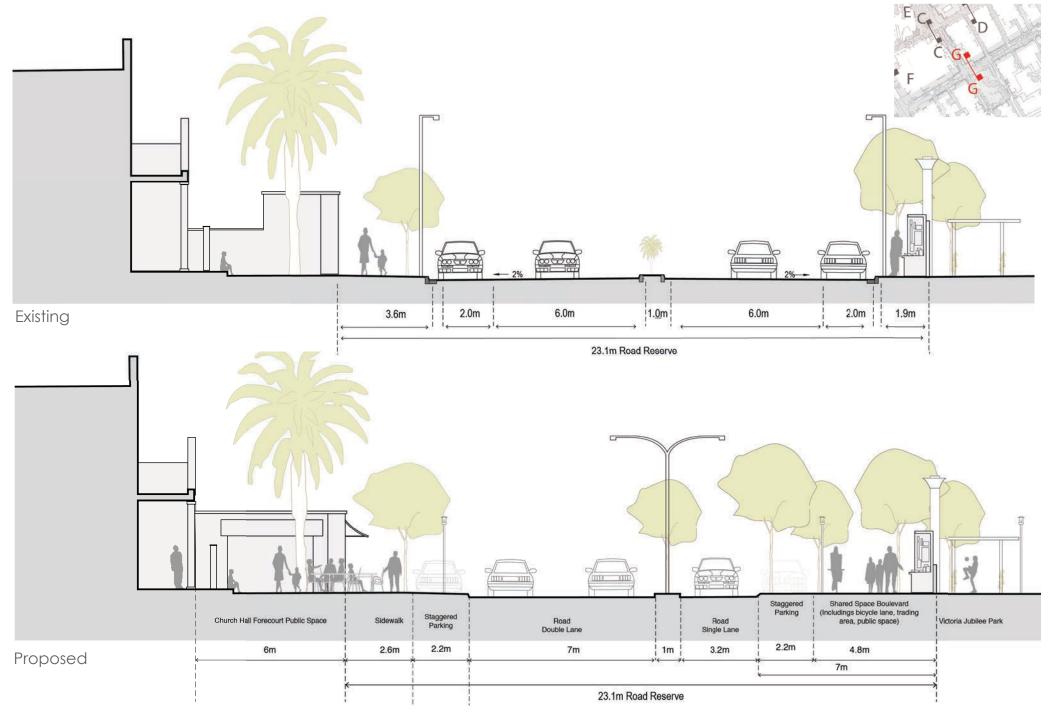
CHURCH STREET SECTION BETWEEN THE CHURCH HALL AND VICTORIA JUBILEE PARK: SECTION GG
